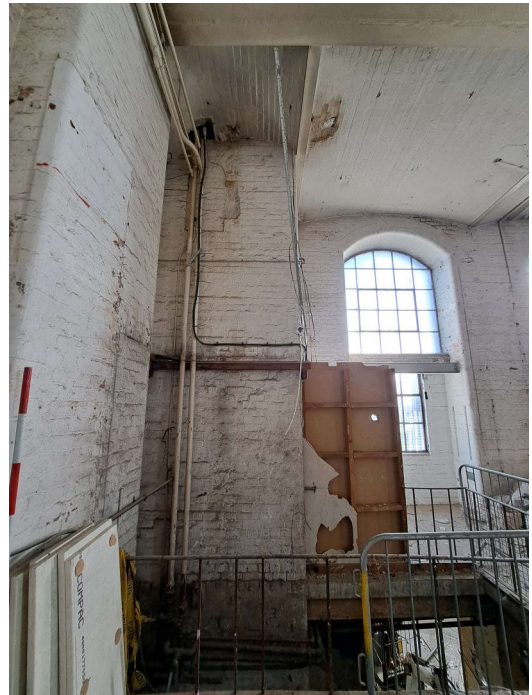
Looking north at chimney stack in north east corner of room FIR 1. Shows blocked opening approximately 3.8m above current floor level. No scale
